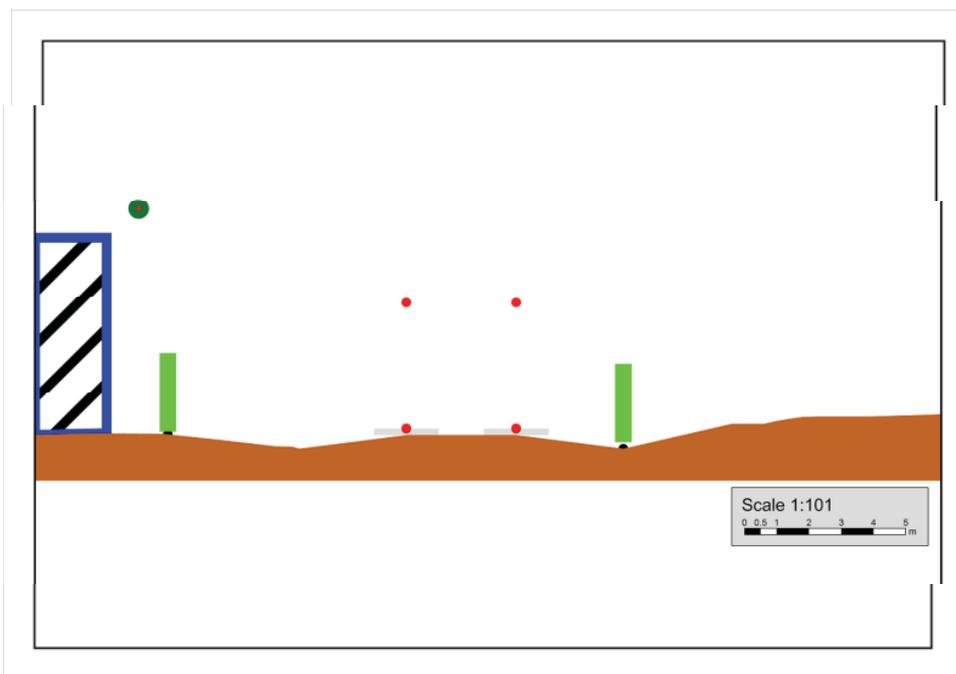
Cross Section at SoA 13, 57 Blenheim Drive
